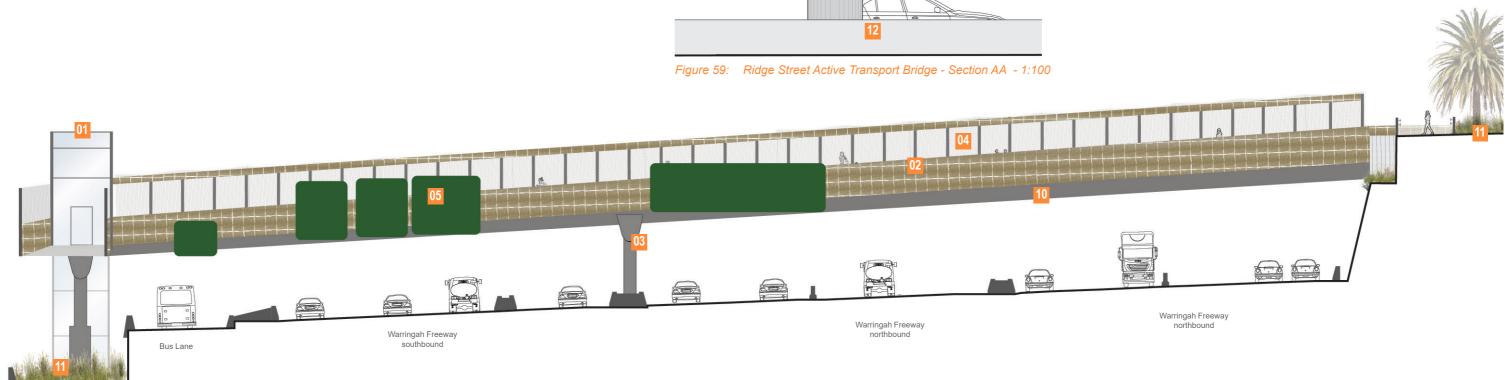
Ridge Street Active Transport Bridge - Elevation A 1:400
